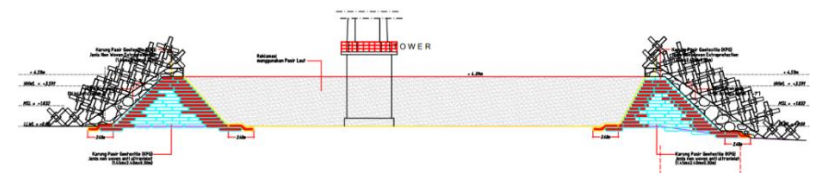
Cross-section of the compilation of planning protection structure with a-jack armor.
